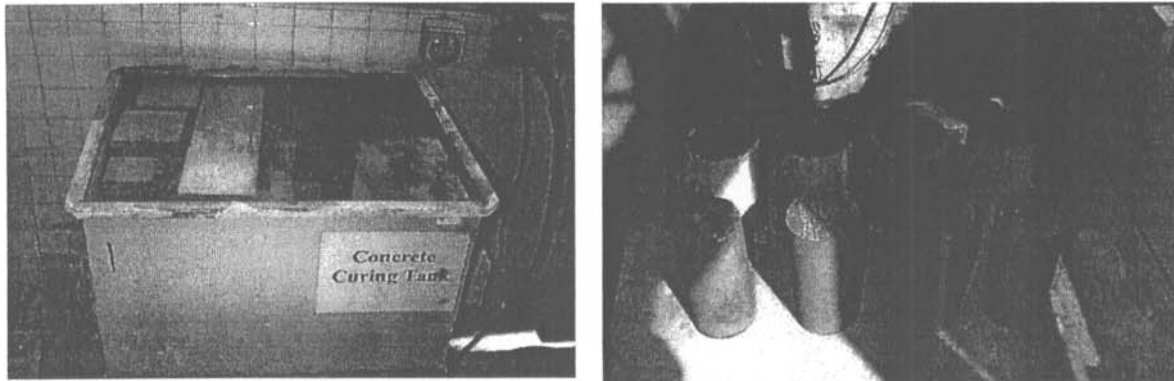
A water tank for concrete curing (left). Cylindrical concrete specimens and steel moulds (right).
